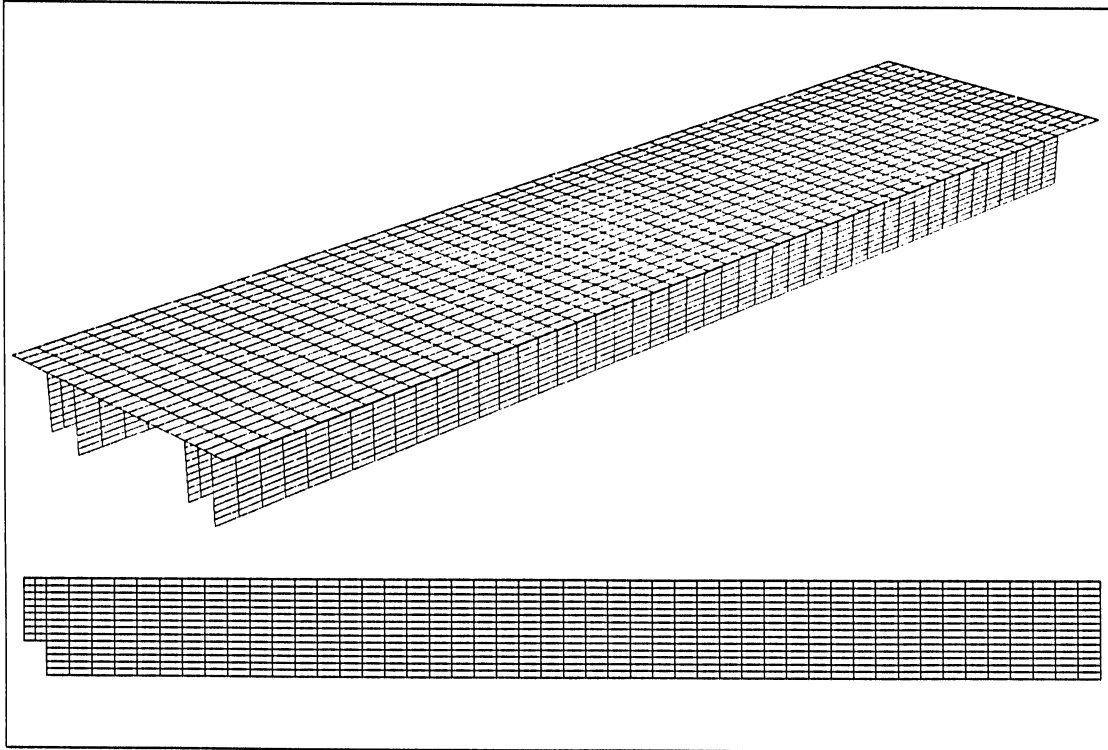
Finite element mesh for the DT-100 girder; full view (top) and elevation (below)
